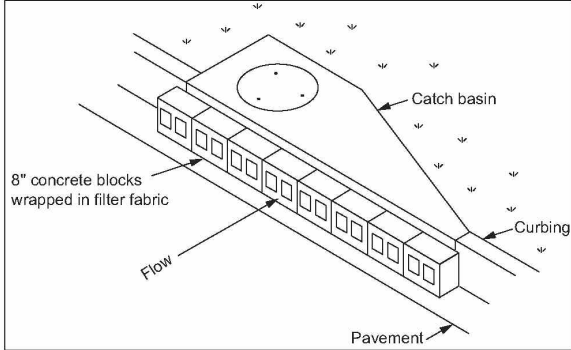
Curb Inlet Filter Installation Requirements (Sd2-P)
